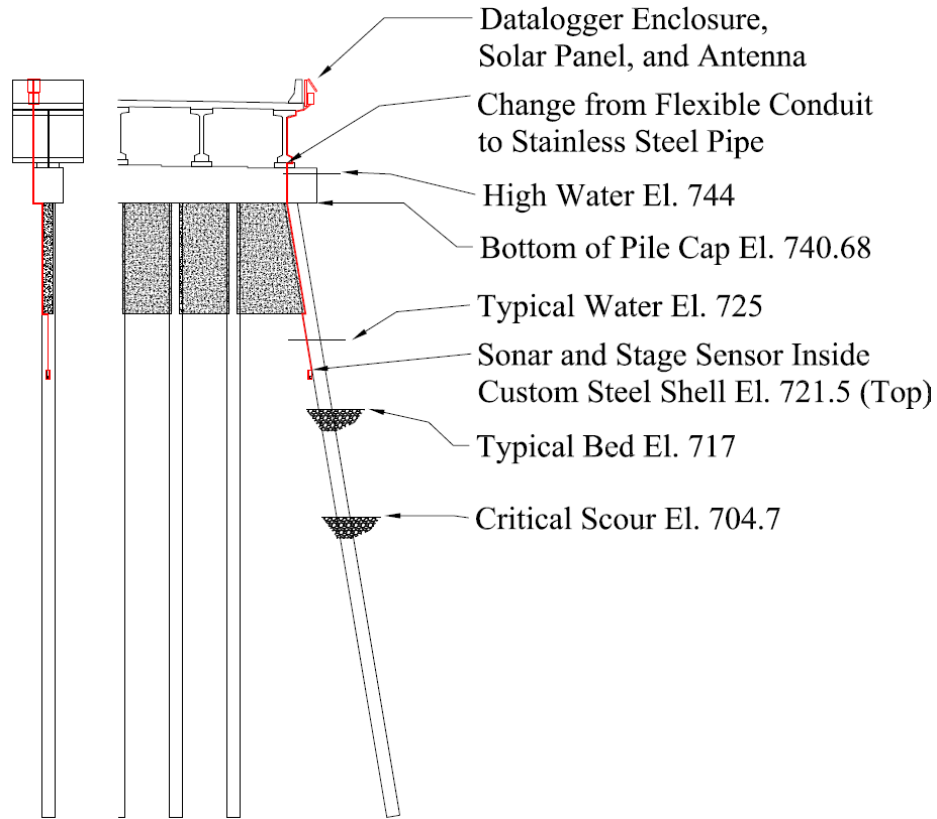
Bridge 23015 - pier 5 sonar installation
